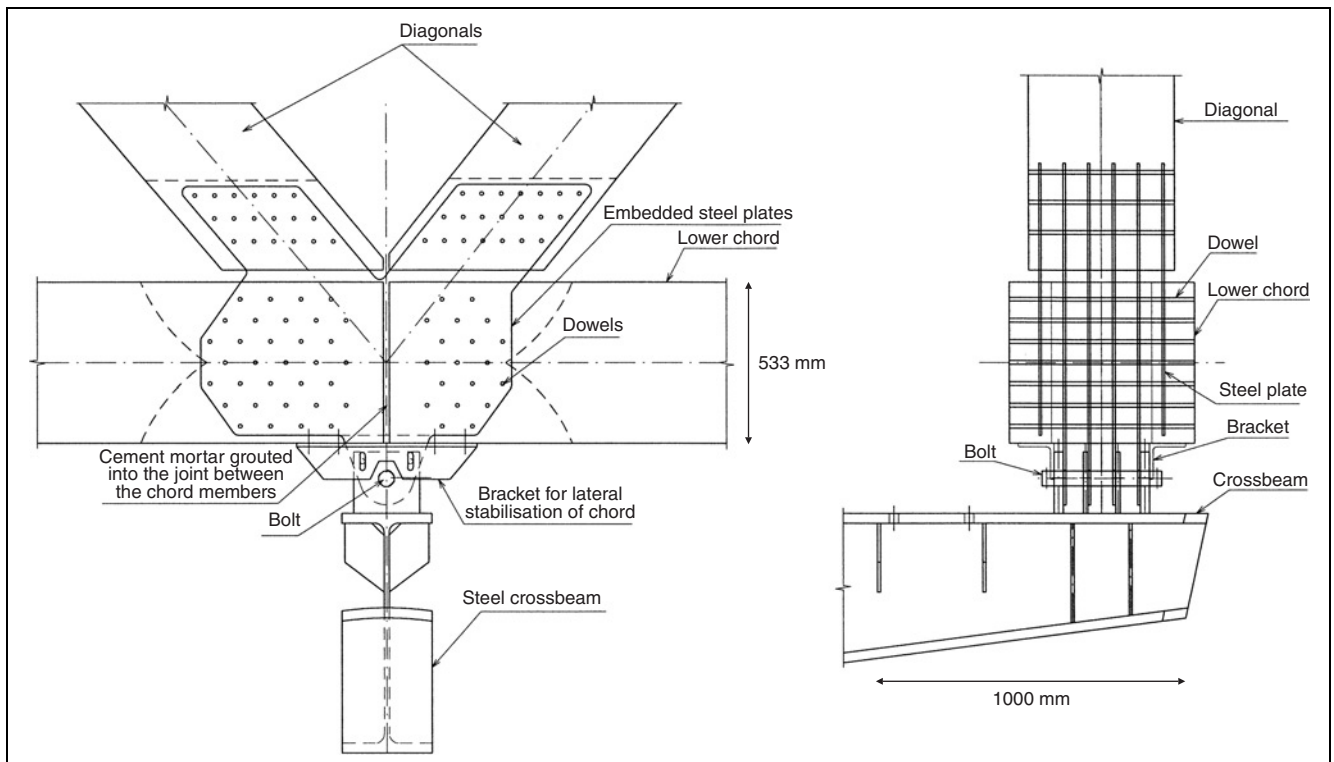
Elevation and section of connection between lower chord and diagonals in the middle truss (cladding, bridge deck and parapet are not shown)
